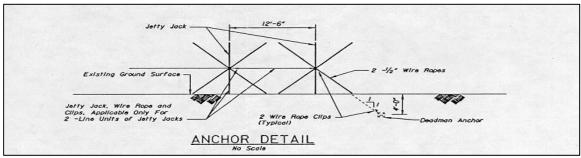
Detail of typical jetty jack and deadman anchoring
